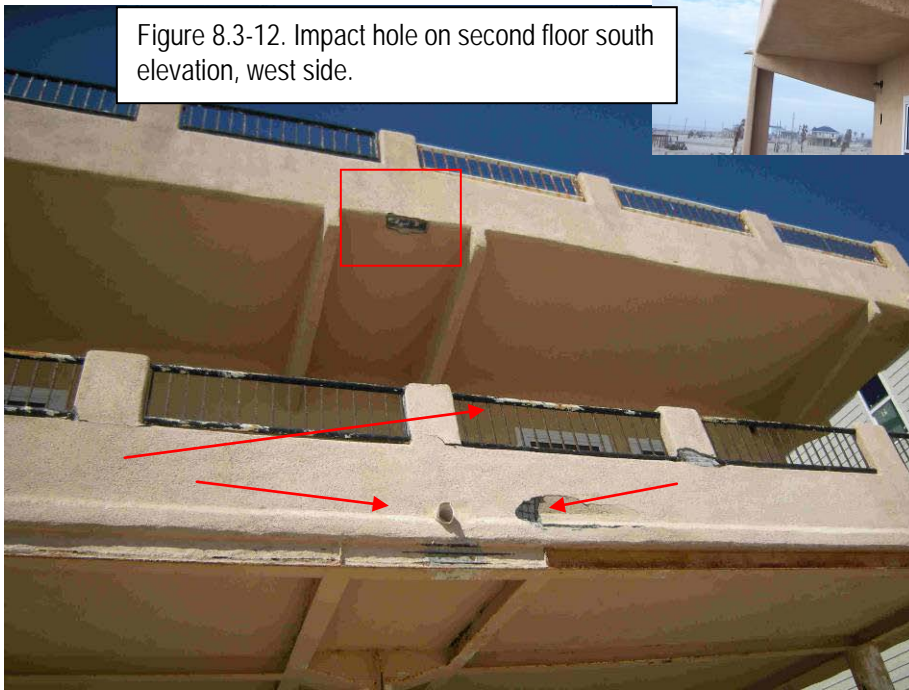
Photograph 3687. South elevation of house – Impact hole on underside of second floor deck, shown also in inset. The bottom hole was due to the concrete cracking when the railing was bent. (remove lower left arrow- drain)
